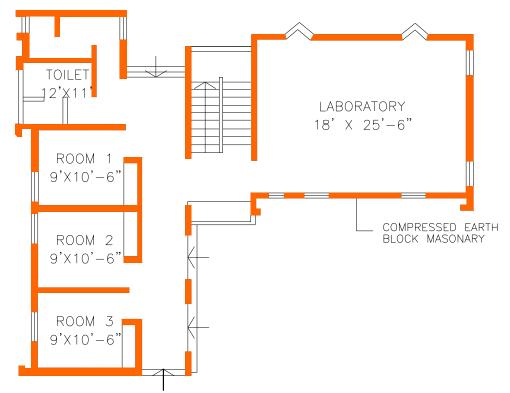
Ground floor plan of ASTRA building, Bangalore
